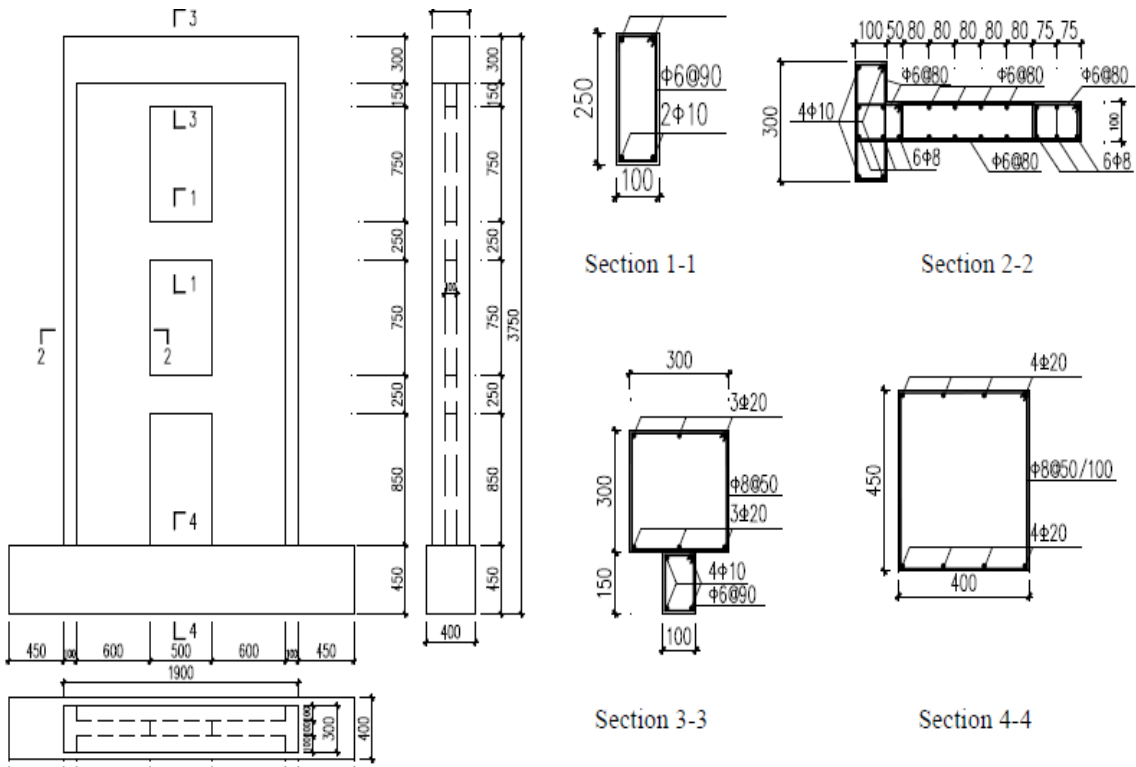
Reinforcement details for slender coupling beams [36]
